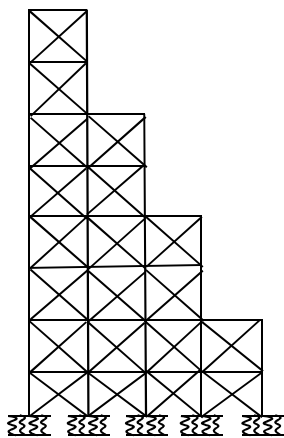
Vertical Geometric Irregular Building considering Soil Structure Interaction
